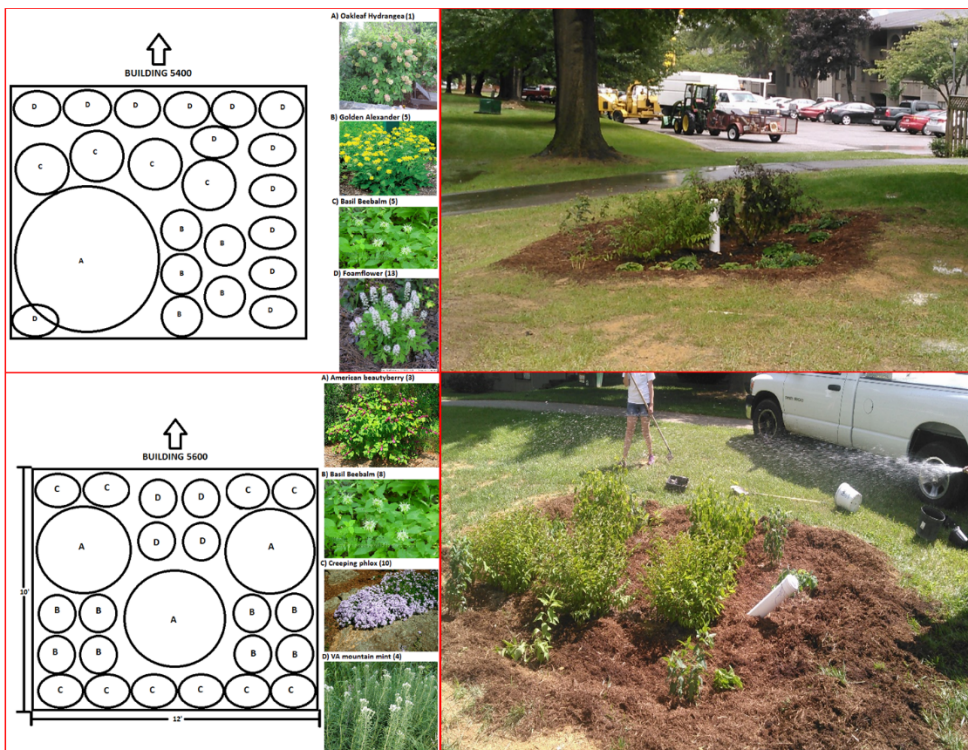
Two small bioretention cells installed at Foxridge Apartments to treat roof runoff.
